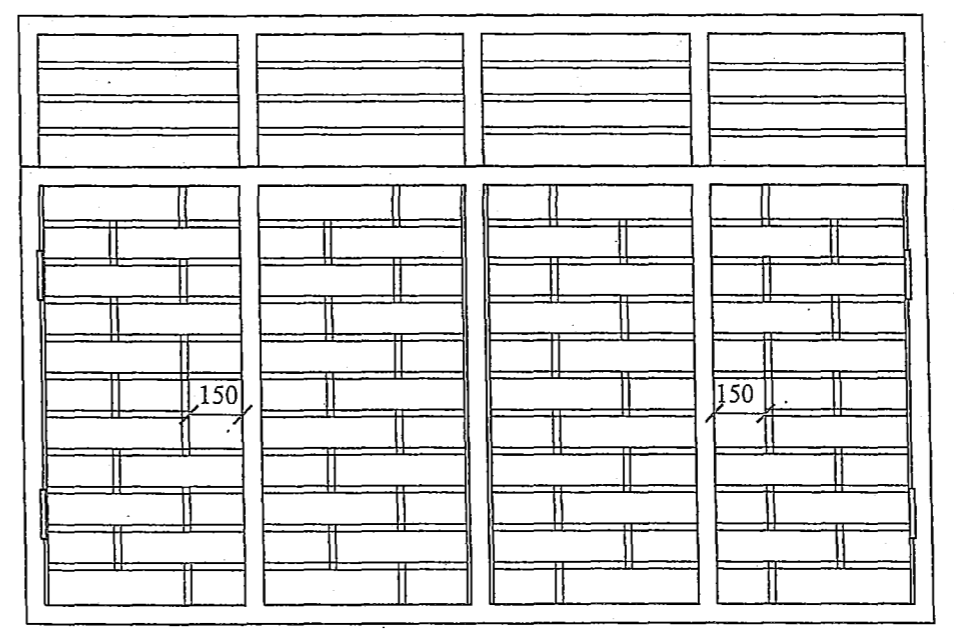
DETAIL OF OUTER SHUTTER FRAME MADE OF ERW TUBE 'P' SECTION
